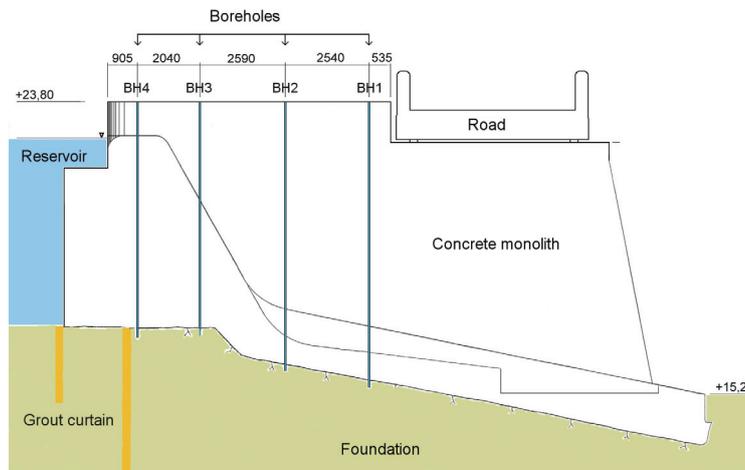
Section of concrete monolith with installed TDR uplift pressure monitoring in BH1-4. From Bernstone et al. (2009).
